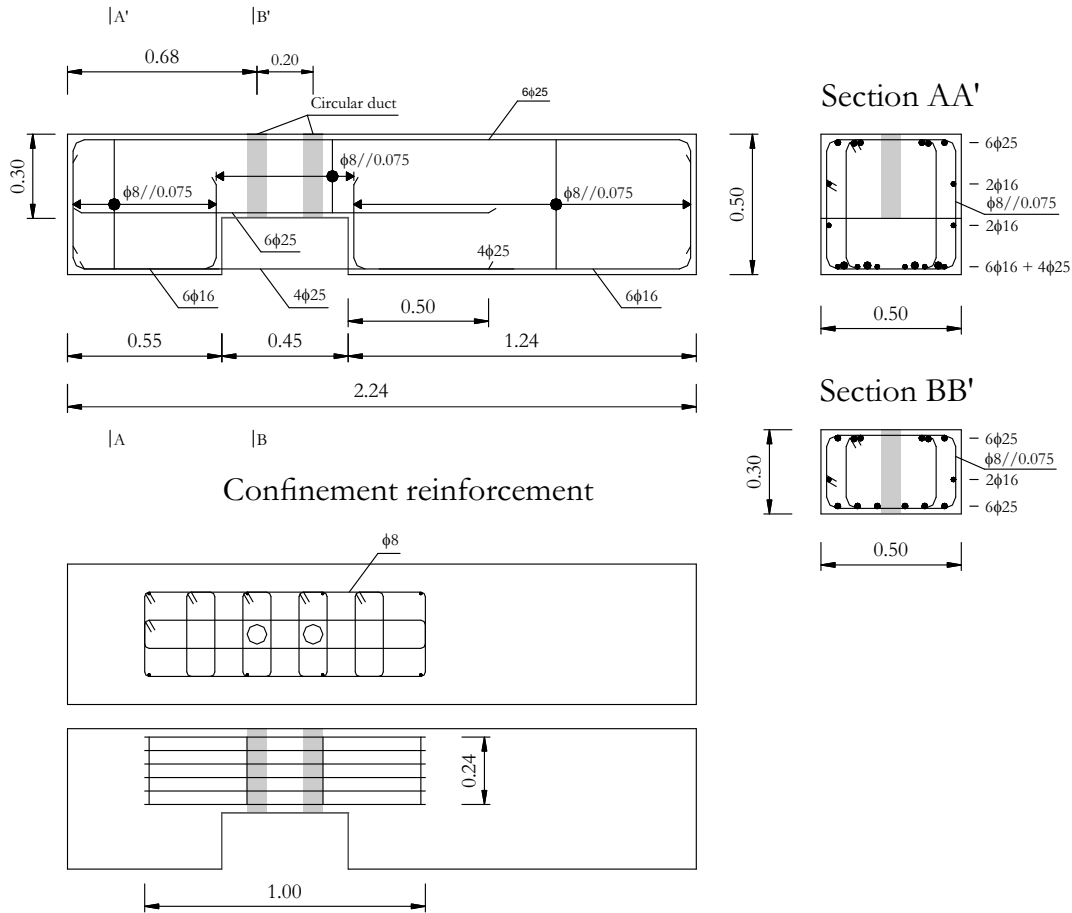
Reinforcement details of base used for specimens RM1 to RM4.
